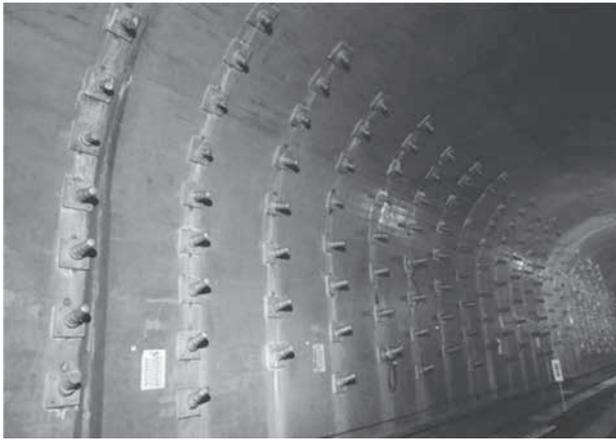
Inside of the tunnel for anchor cables to stabilize the bedrock (photo; July 2015)
